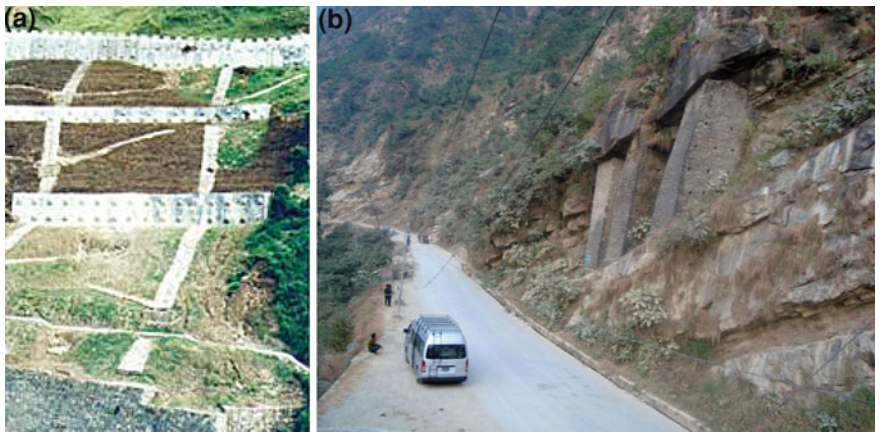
a Various anchored structures and toe walls in a roadside slope (Photo: Department of Roads, Nepal), b Prop wall to support hanging sandstone beds in Siwalik
